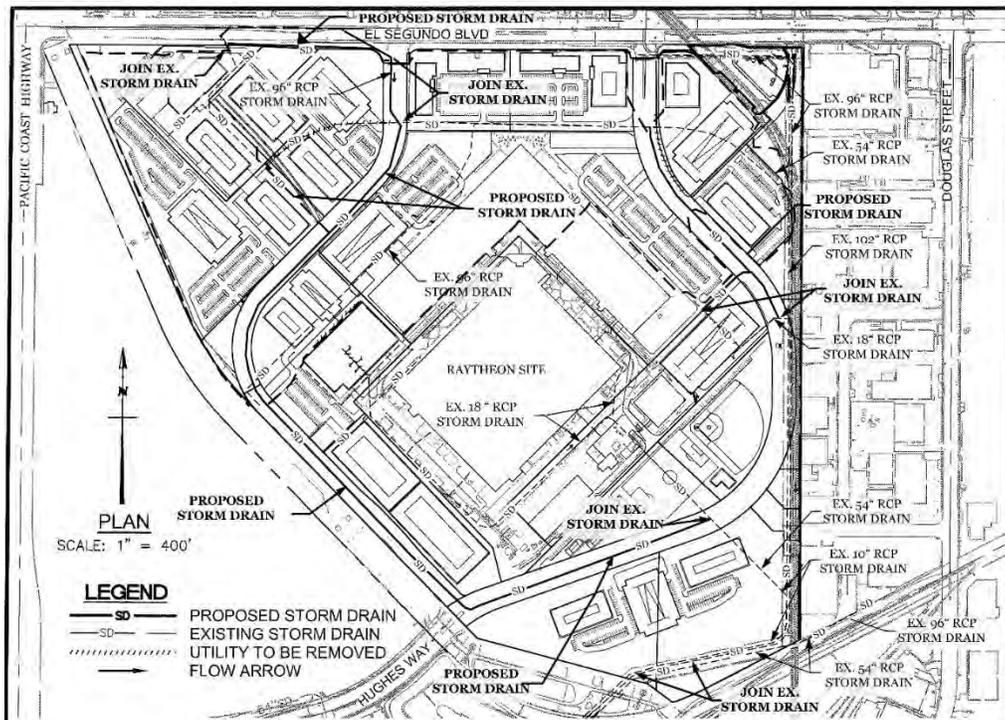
CONCEPTUAL DRAINAGE PLAN
